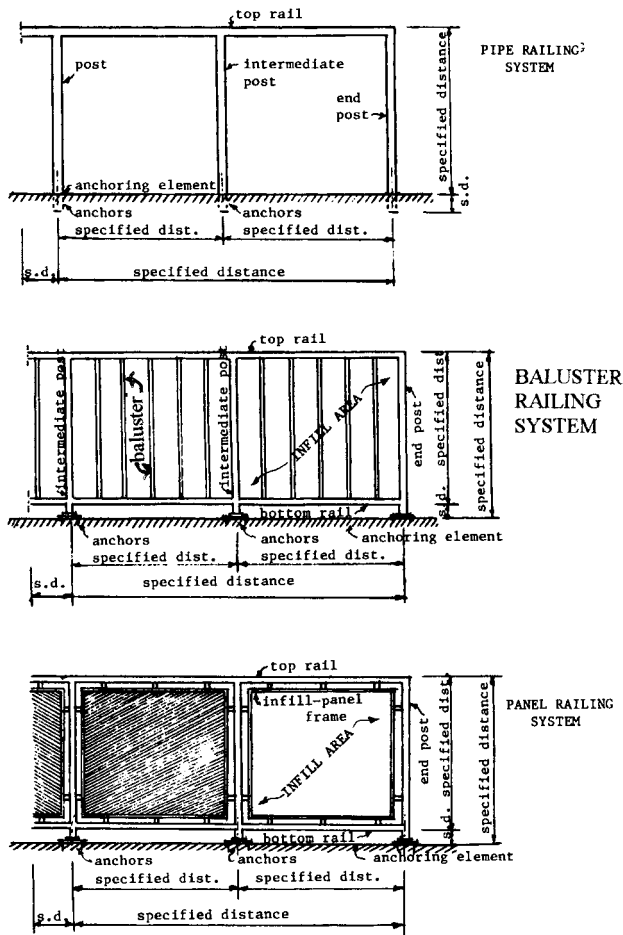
Front Views of Sections of Three Typical Railing Systems
